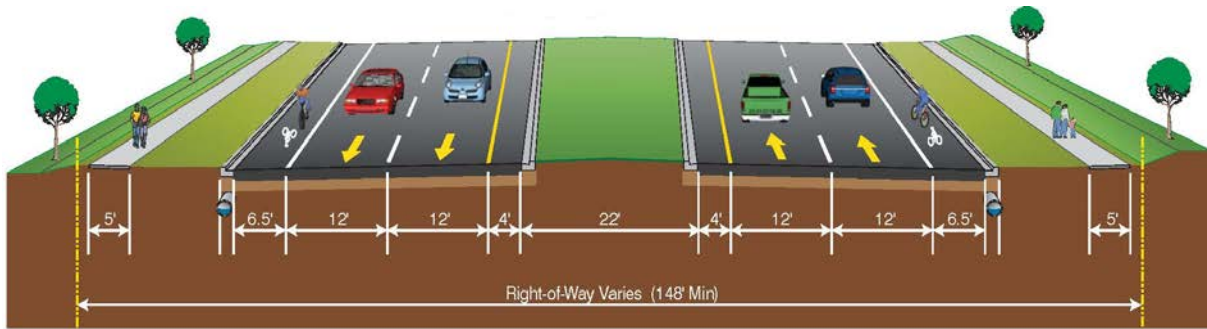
5 Existing Typical Section from Marie Street to US 1
